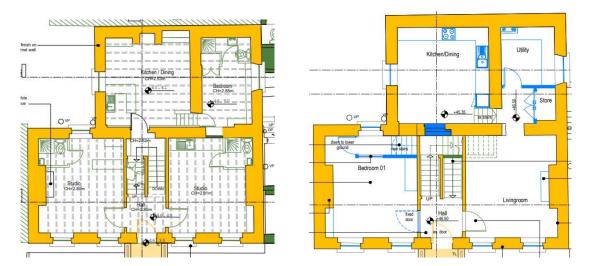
Existing Entrance Plan (L), Proposed Entrance Floor Plan (R), Historical Fabric (Yellow), Modern Retained (Green), Proposed (blue)
